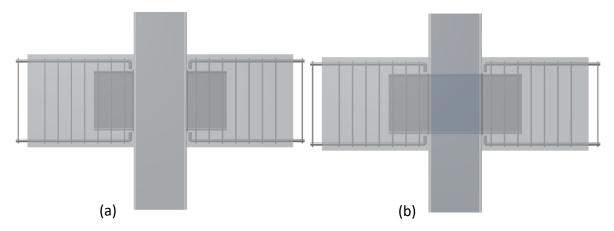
Simple connection between concrete beam and concrete filled steel tubular column with embedded corbel
